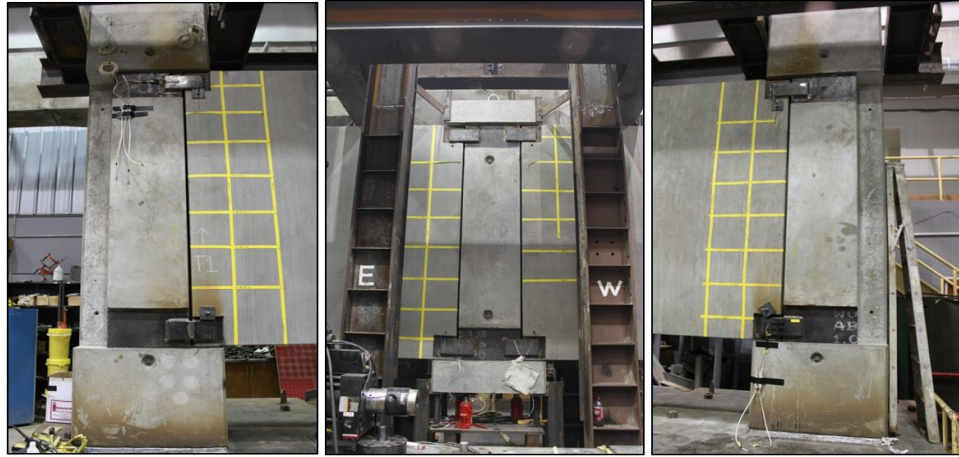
Elevation views, development of the first observed cracks in the end-columns at Δ of 1.8 in. (45.7 mm)
